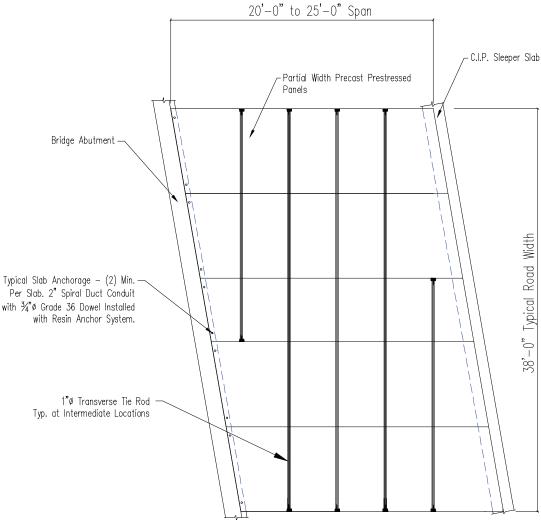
Conceptual representation of the proposed PCPS Bridge Approach Slab
